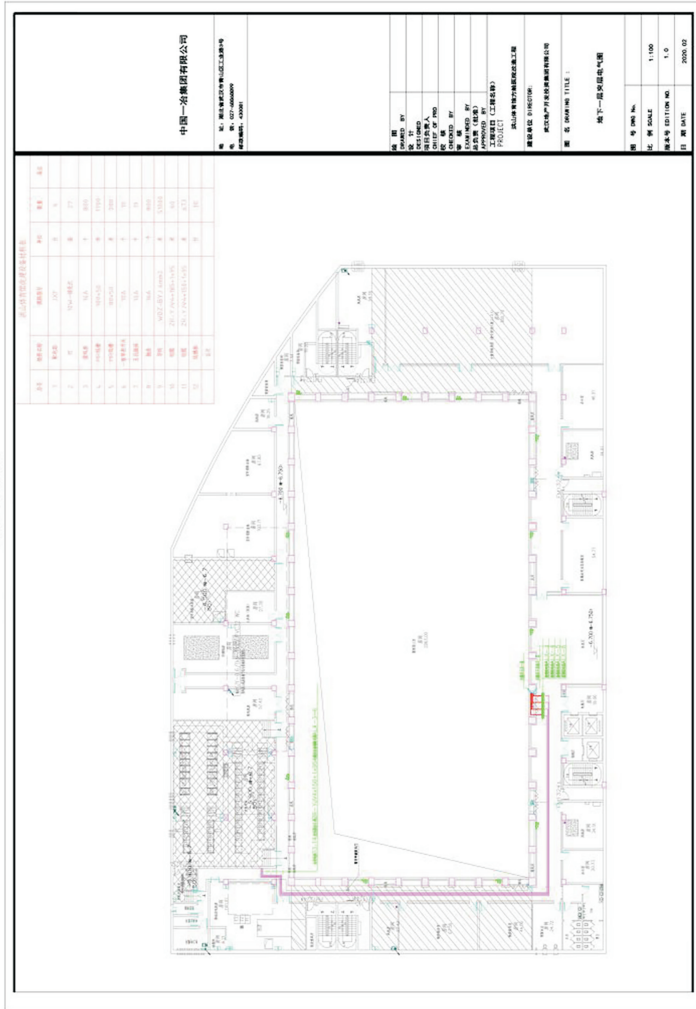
Plan of Wuchang Fangang Shelter Hospital Basement 1 interlayer
